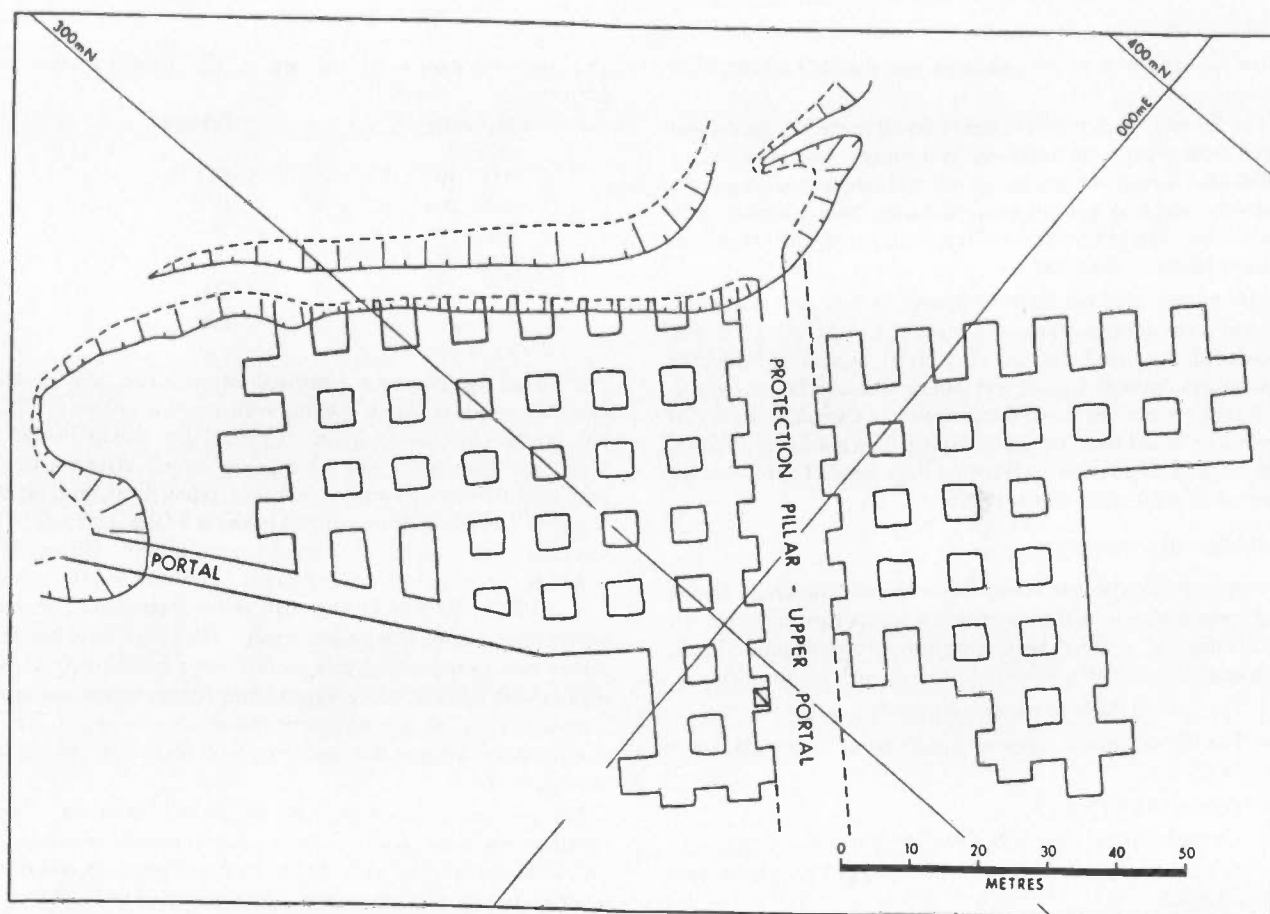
Pillar layout Lower Undercut before Pillar Stripping
